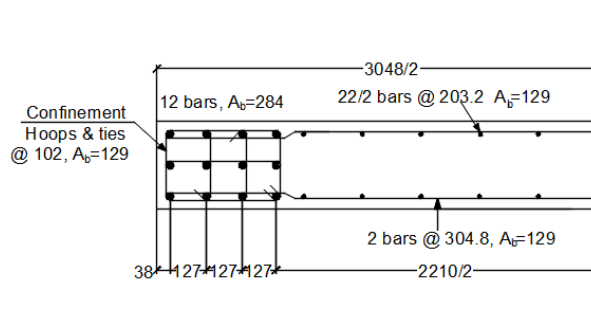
Cross section of the reference wall (unit: mm; A_b : cross-section area of each bar).
